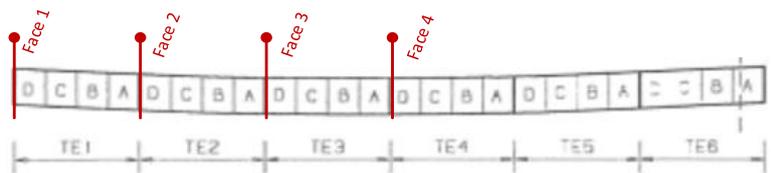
, WIJERTUNNEL ELEMENT FACES
